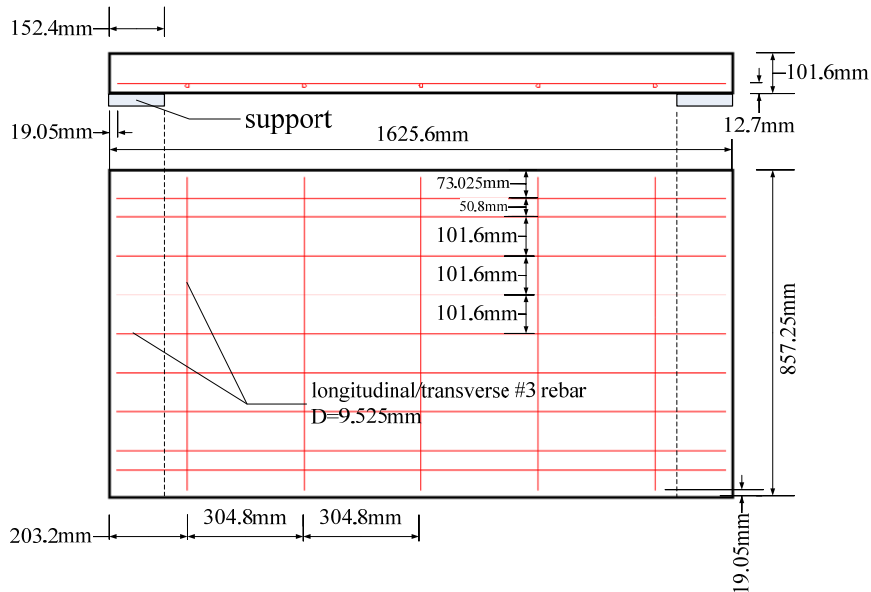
Geometry and reinforcement details of the RC slab (adapted from [10])
